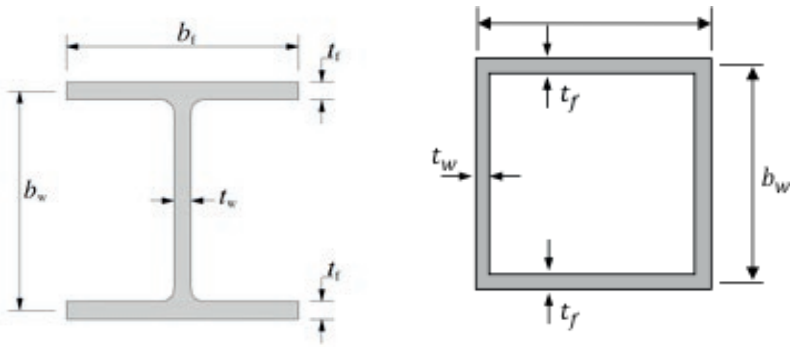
Symbols used for the geometric dimensions of double symmetric sections: (a) I-section and (b) tubular section
